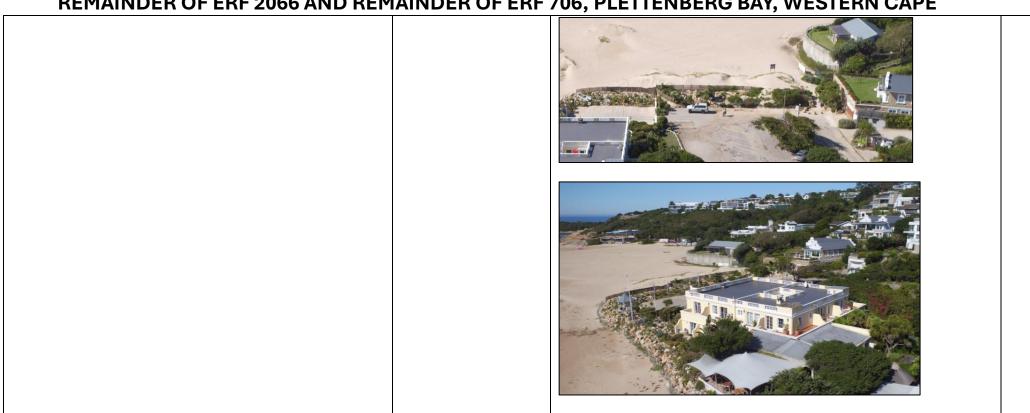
depicting the damage of the September 2023 storm event with the wooden decks, furniture and balustrade completely destroyed
